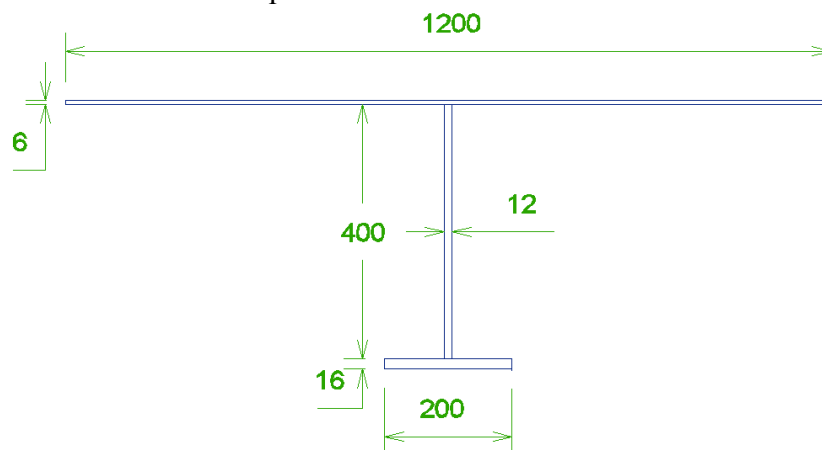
, Dimensions in mm of Primary Stiffener arrangement
